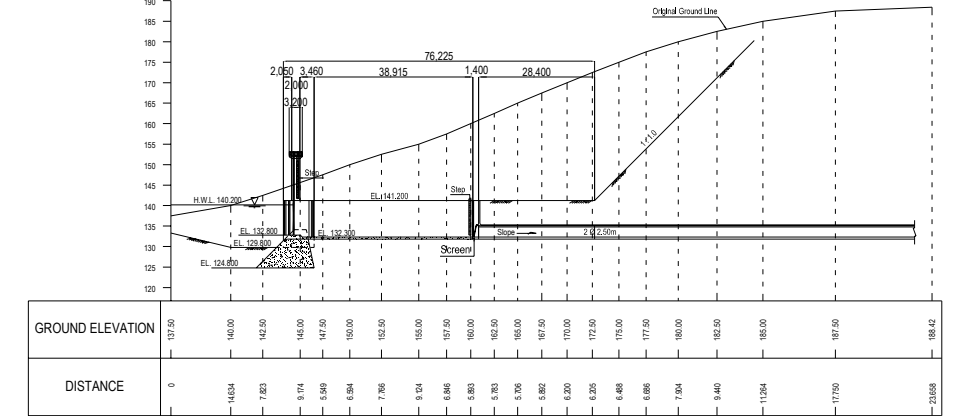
Layout Plan of Keduang River Sediment Bypass (1/2)
